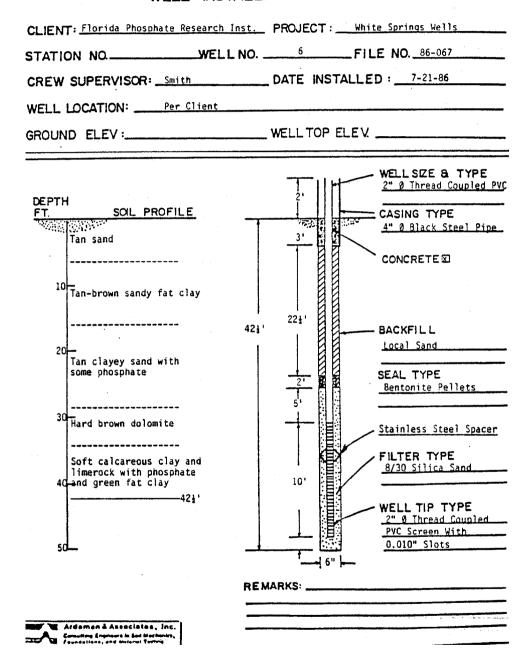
Well Installation Record at Well 6, White Springs Road.
